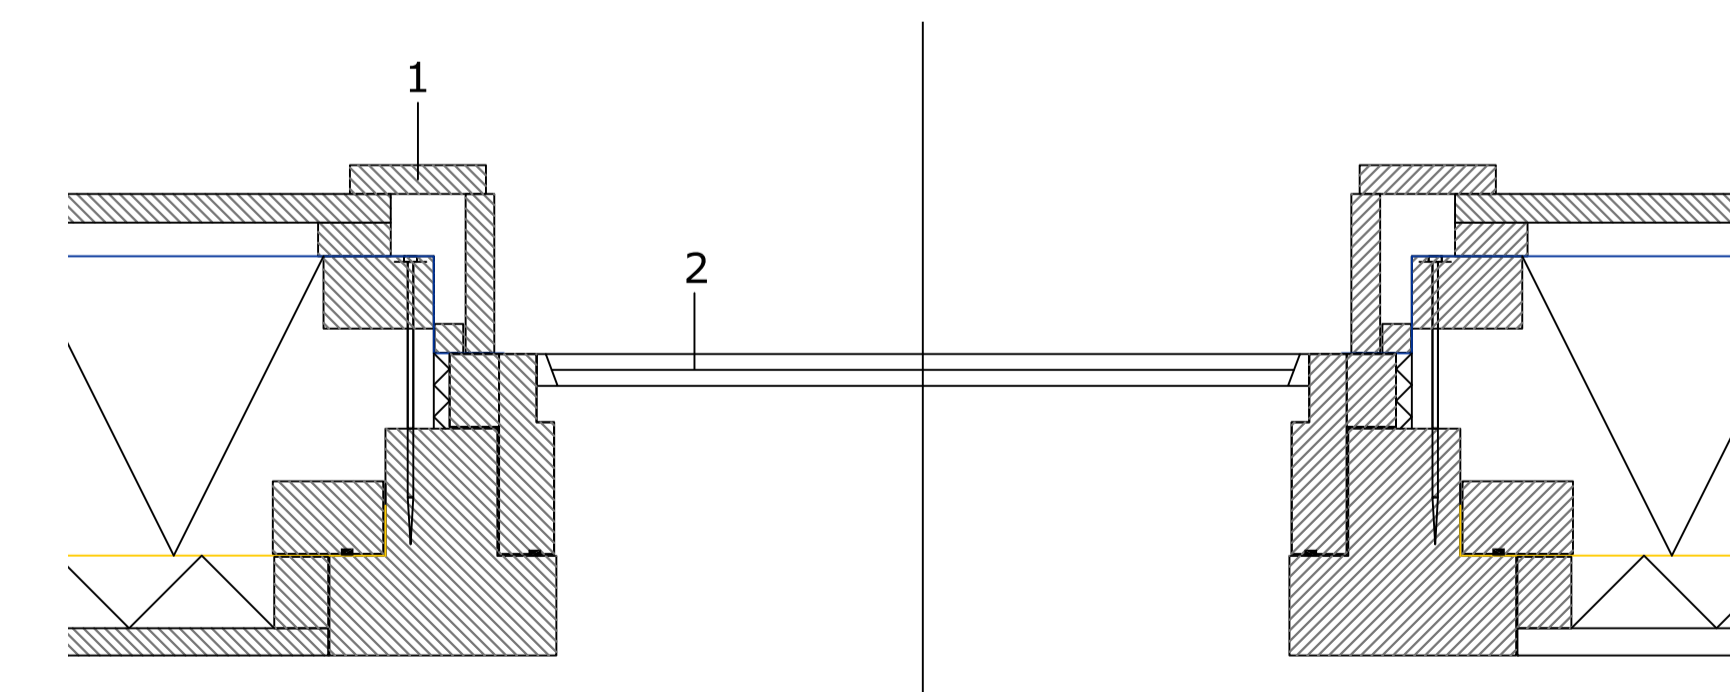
wall - vertical section - connection to roof northern side - 1:5
